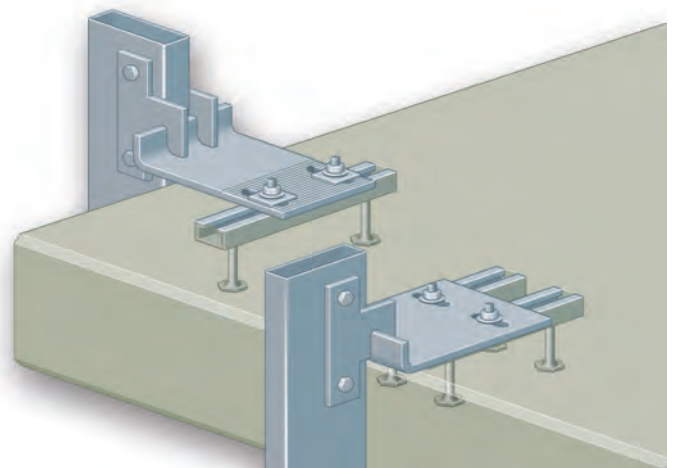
Smooth cast-in channel positioned parallel to edge of slab (left); serrated cast-in channels placed perpendicular to edge of slab (right) (Source: HALFEN GmbH)
